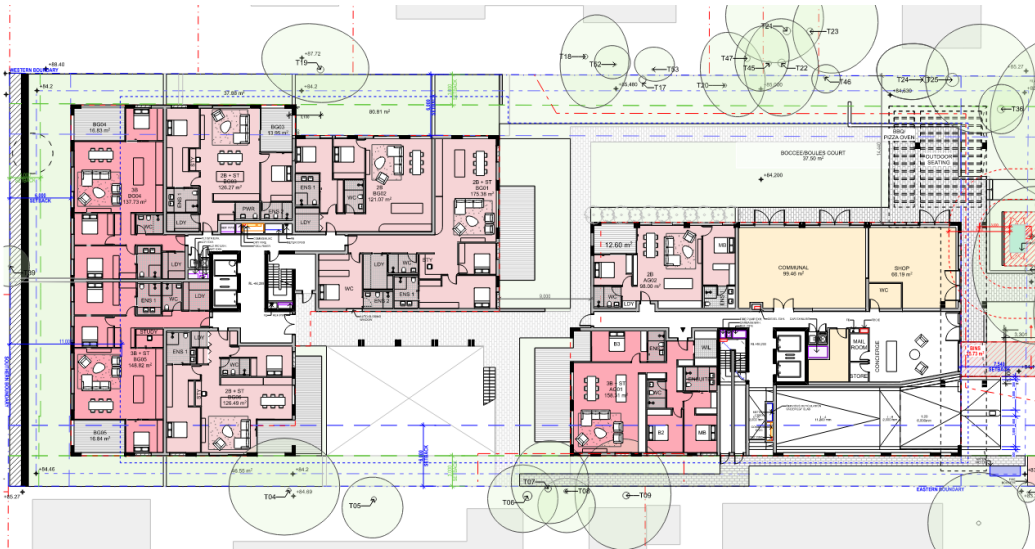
Proposed Architectural Ground Floor Plan – Chrofi Architects
